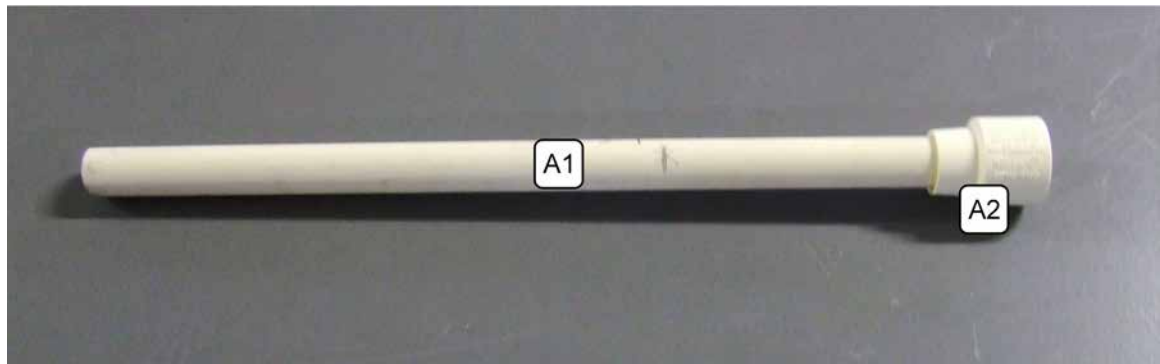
A Applying cleaner or glue to the joint surfaces before gluing.
